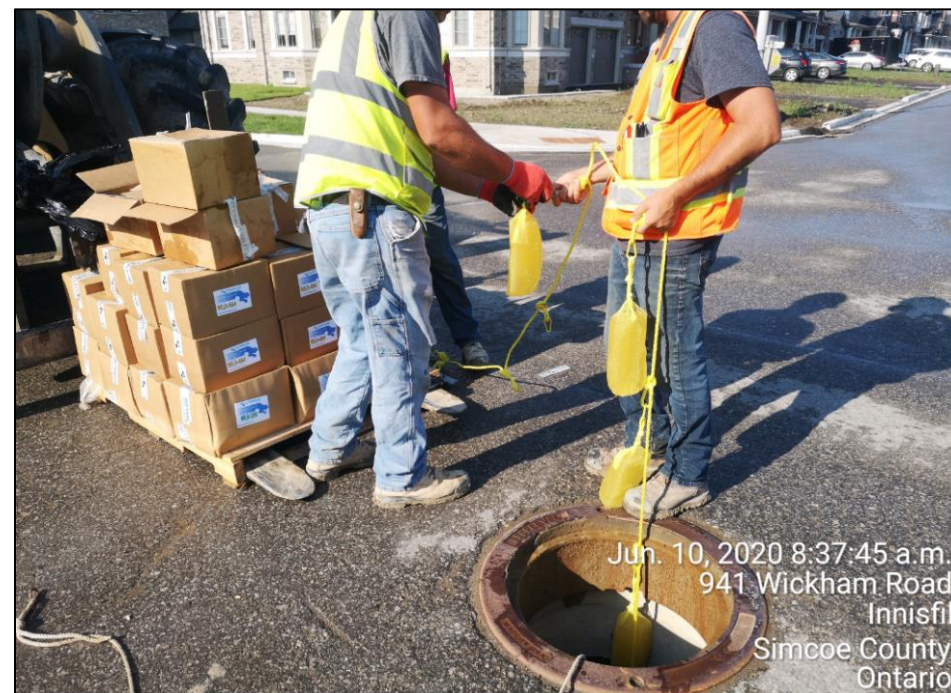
Initial shipment packaging for Gel Flocculant Blocks (WLB 494 & WLB 360)
